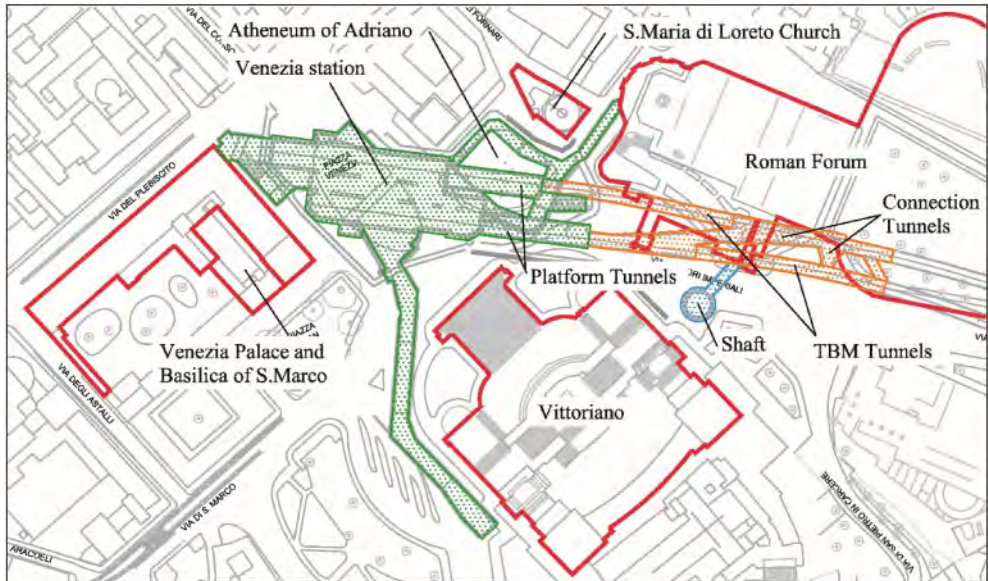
Planimetric view of the monuments potentially interfering with the excavations.
